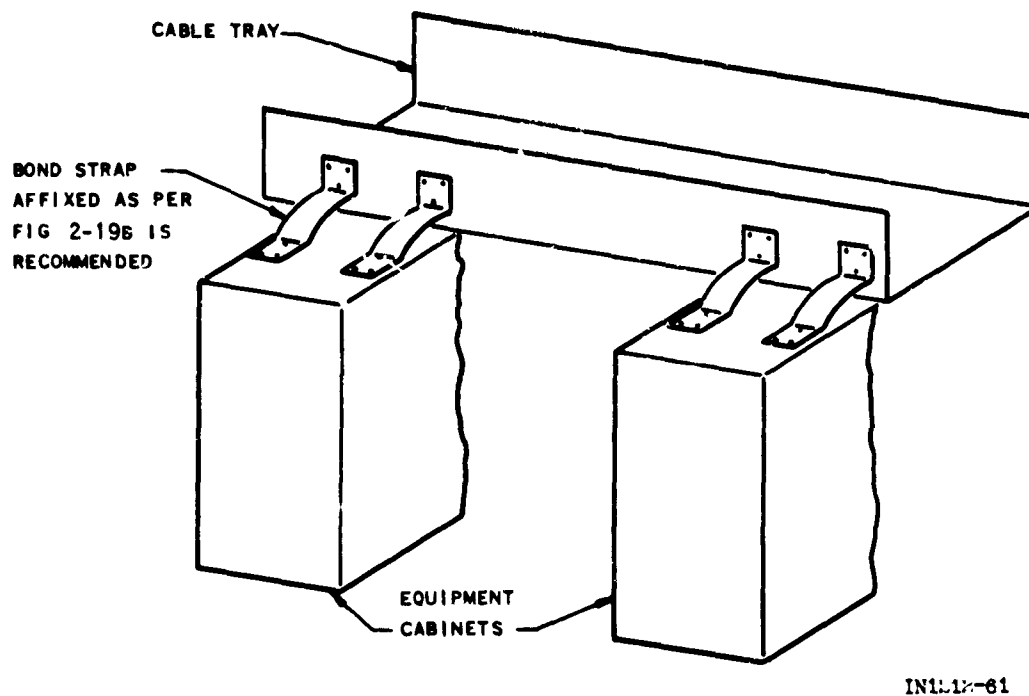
Equipment Cabinets Bonded to Cable Tray
